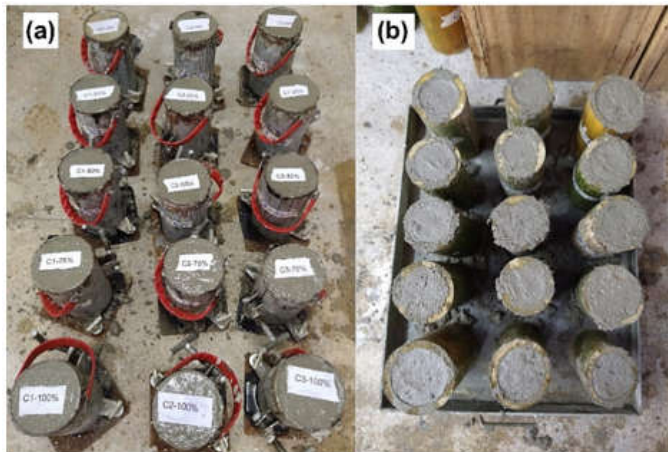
Specimens of (a) concrete and (b) bamboo filled with concrete
